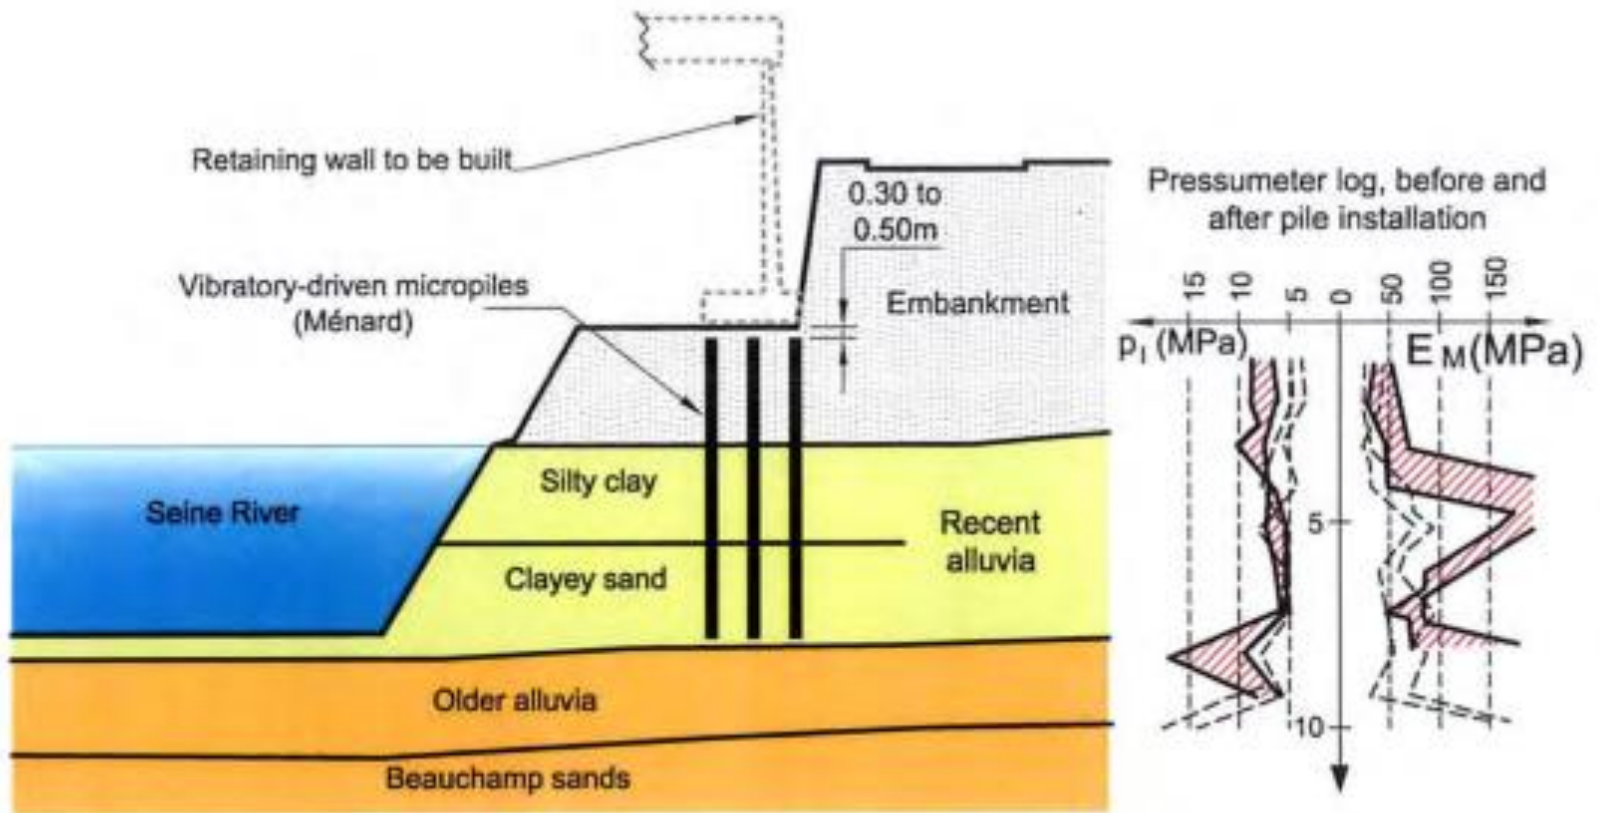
Improvement in foundation soil characteristics thanks to the installation of piles (France).
